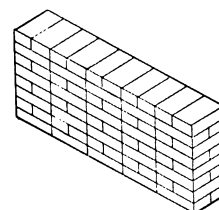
Wall with Headers and Stretchers and Yet Weak.
